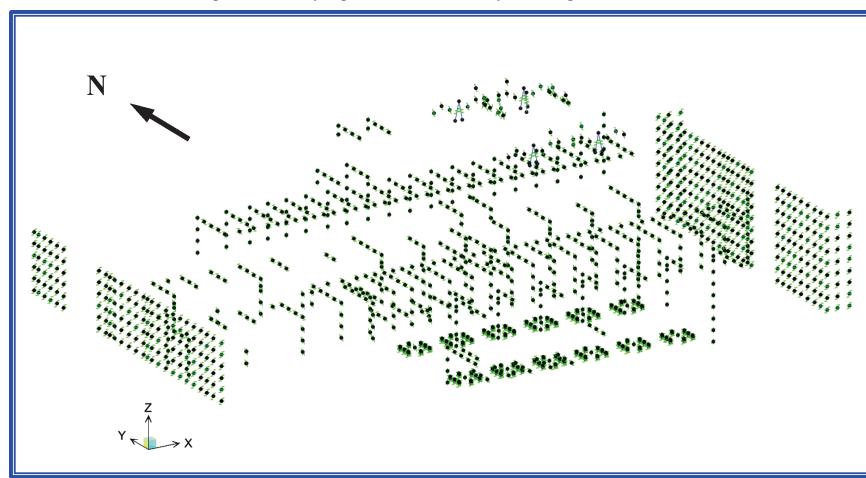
Elevation View of Triple Building SAP2000 Model Showing Separation
